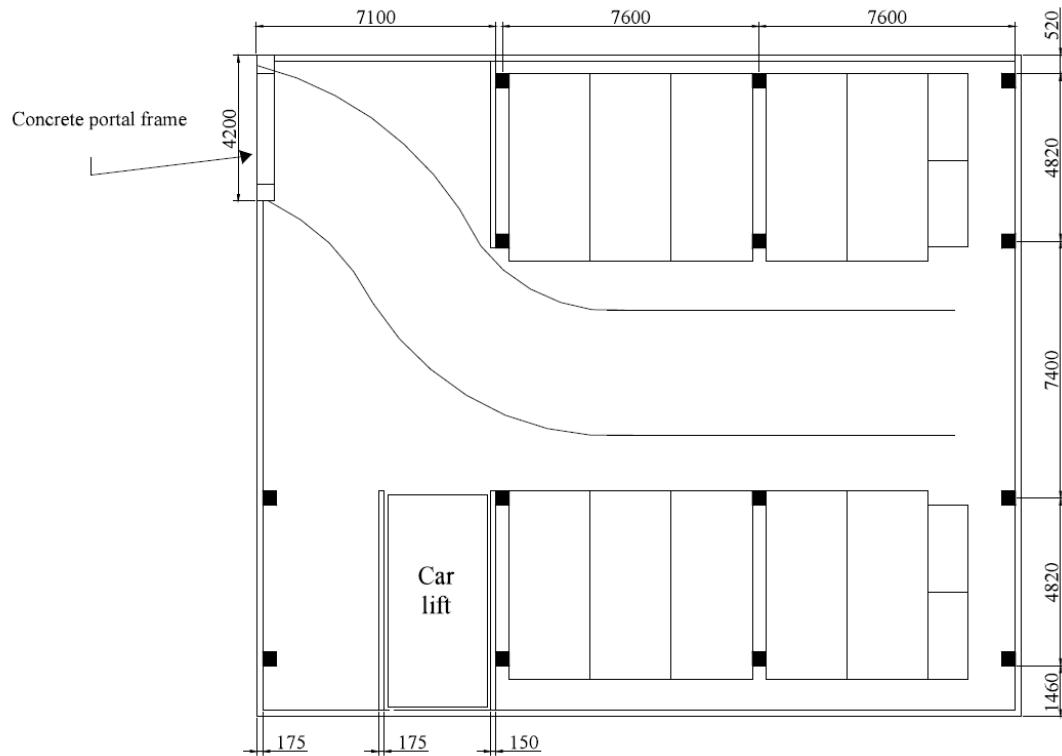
Floor plan of parking garage beneath Quest hotel building (Amigo, 2010)
